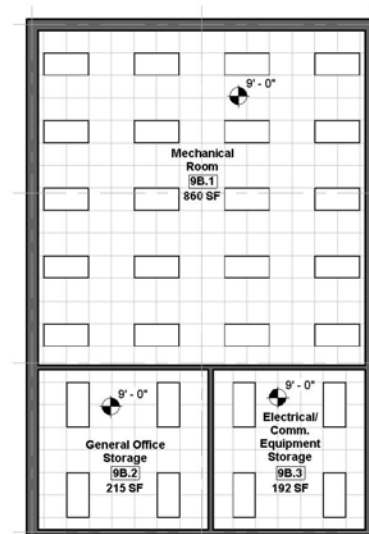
Module 9B: General Support – Reflected Ceiling Plan
